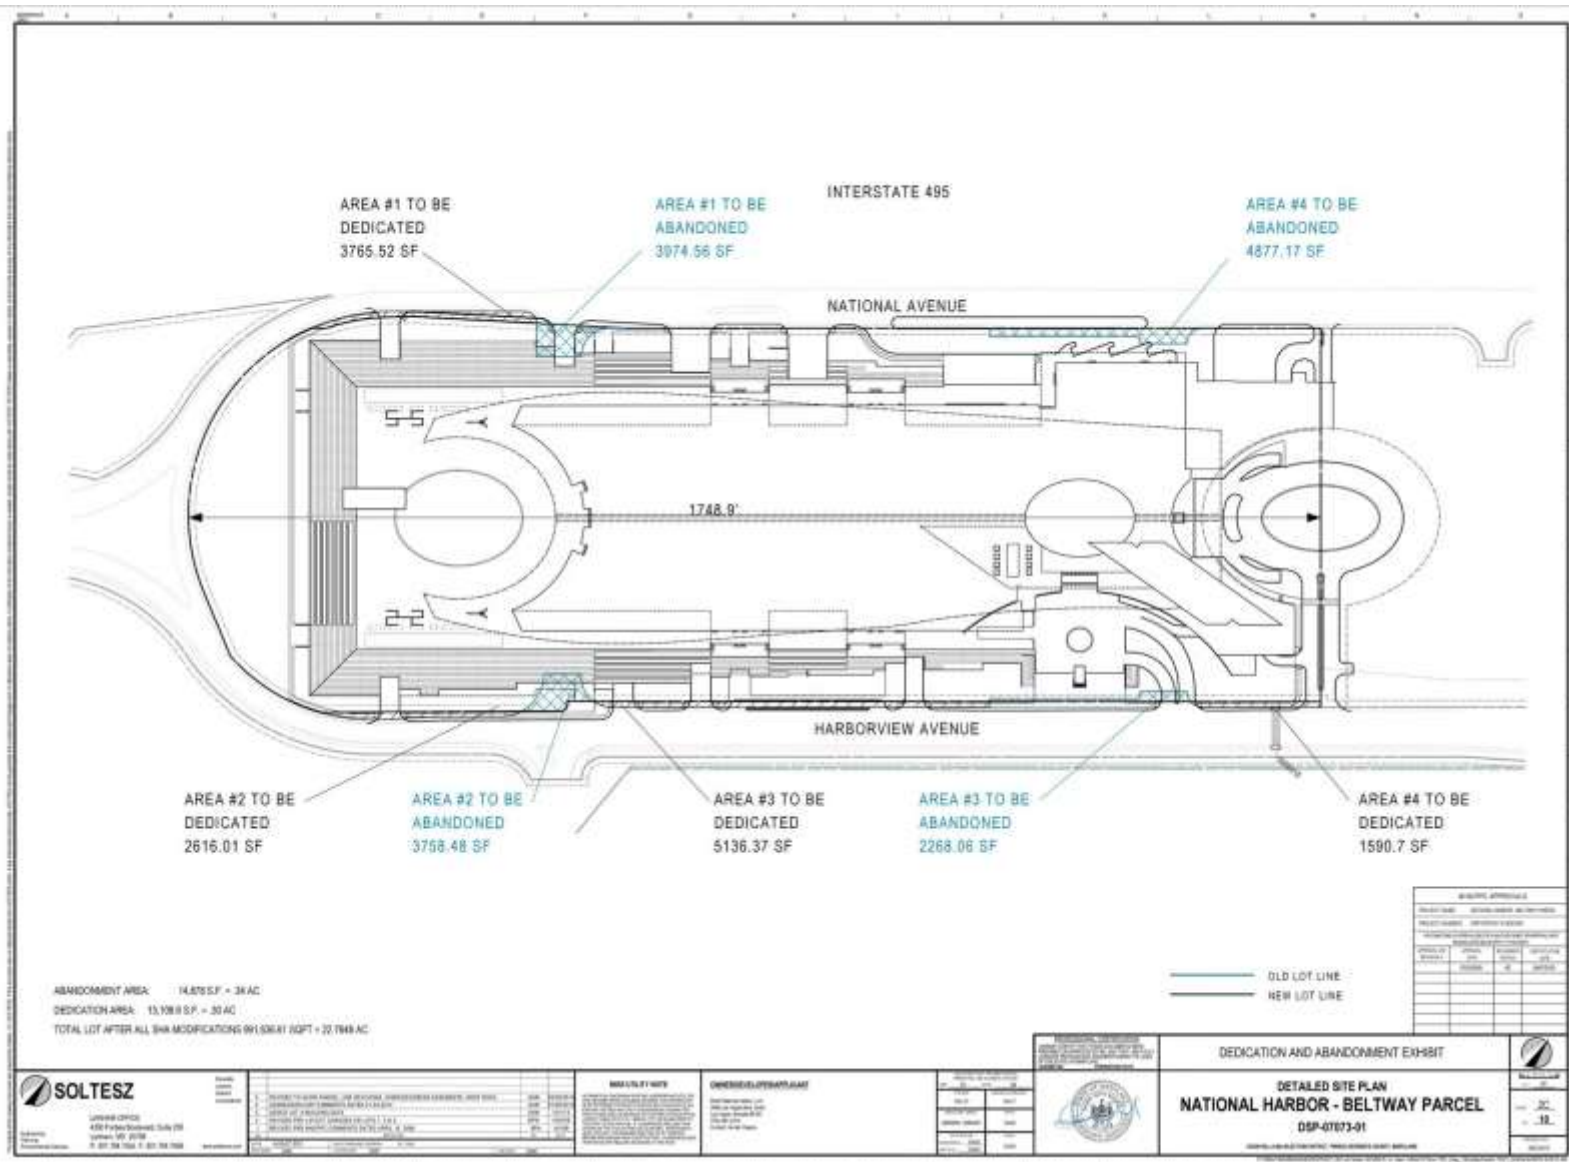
DETAILED SITE PLAN SET (PAGE 2B OF 10)
